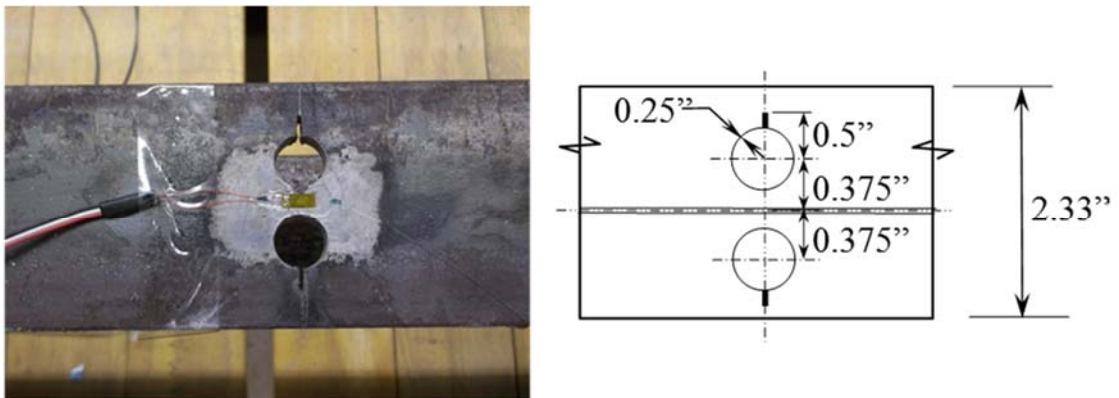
Initial edge cracked holes in bottom flange of steel test beam SB-3.
